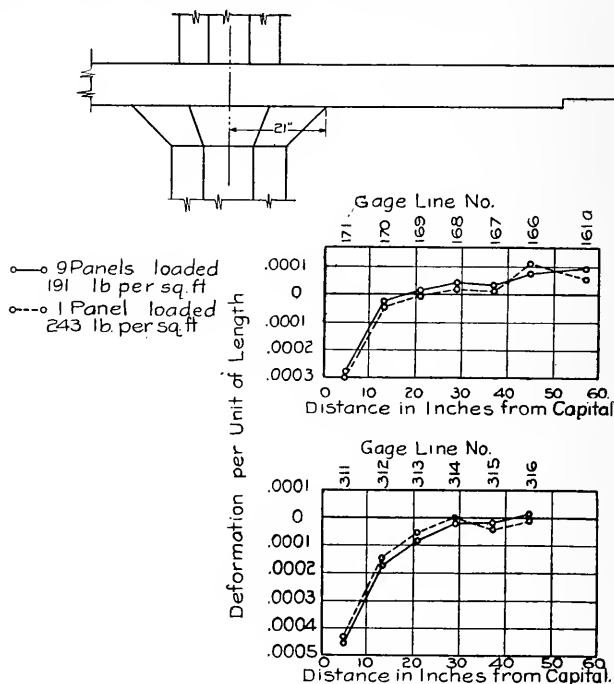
POINTS OF ZERO UNIT-DEFORMATION ON UNDER SURFACE OF TEST FLOOR NEAR INTERIOR COLUMNS OF SHREDDED WHEAT FACTORY.
